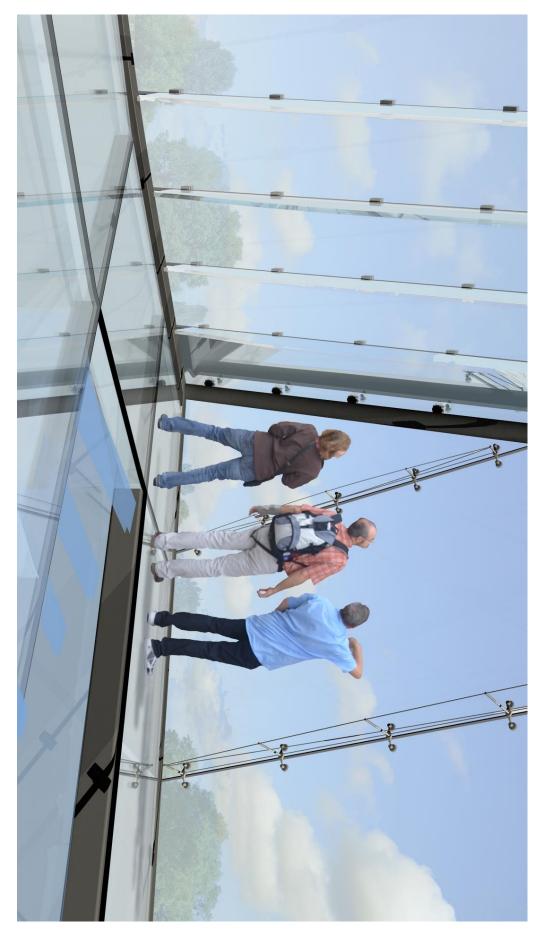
Inside render of roof, showing the cable truss and glass stairway. Source: own ill.
